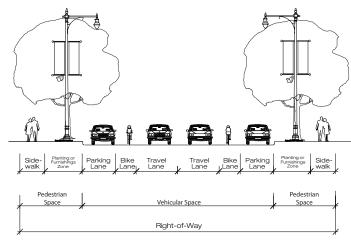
(1). Typical Right-of-Way (Property Line to Property Line) Elements.
